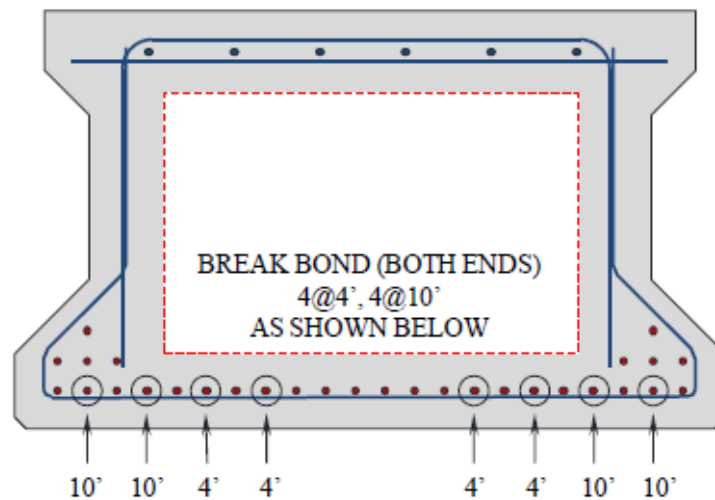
Reinforcement detail and debonding pattern for the specimens (4B28)(Avendano et al. 2013)
